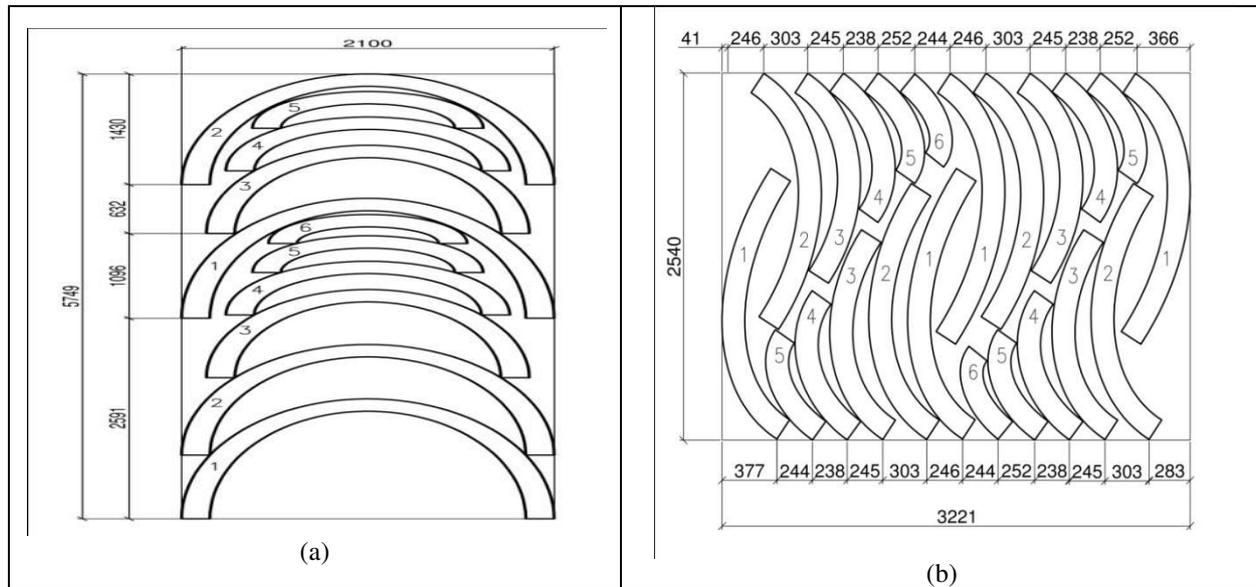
Layout of elements: (a), (b) layout options; 1-6 –elementnumbers
